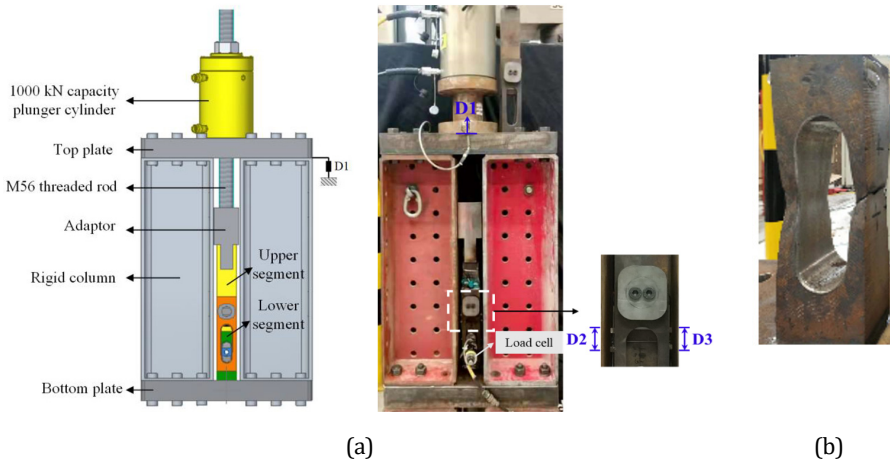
Test set-up and failure mode for C1-WCs under static loads (a) Test set-up; (b) Failure mode
